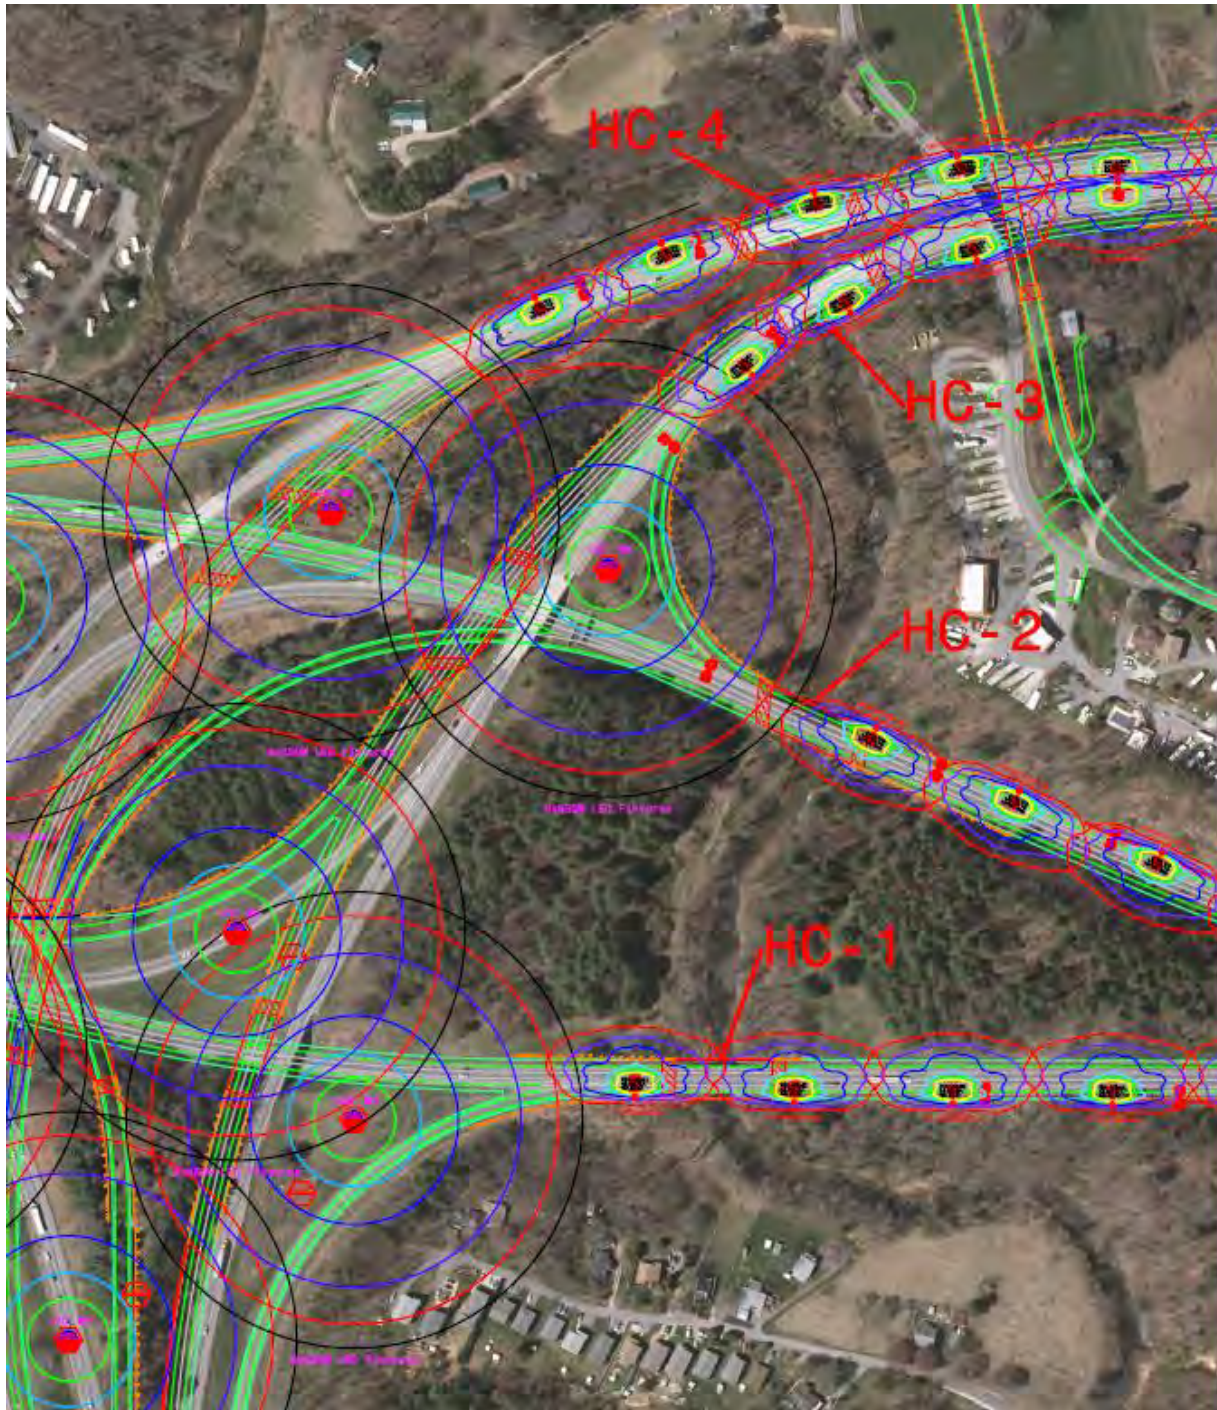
Original lighting layout at HC-1, HC-2, HC-3 & HC-4 crossings.
